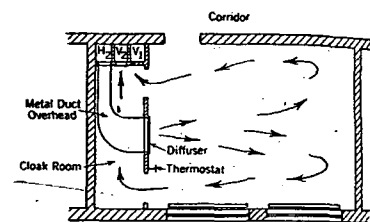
PLAN OF A CLASSROOM IN A SCHOOL VENTILATED BY A CENTRAL FAN
